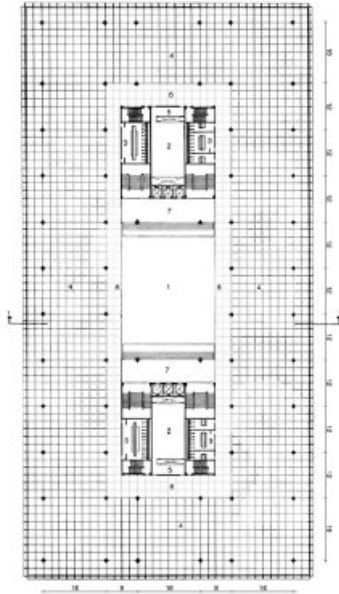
Plan of the typical UBA block. Source: *Revista Construcciones* 219 (1969): 466.
